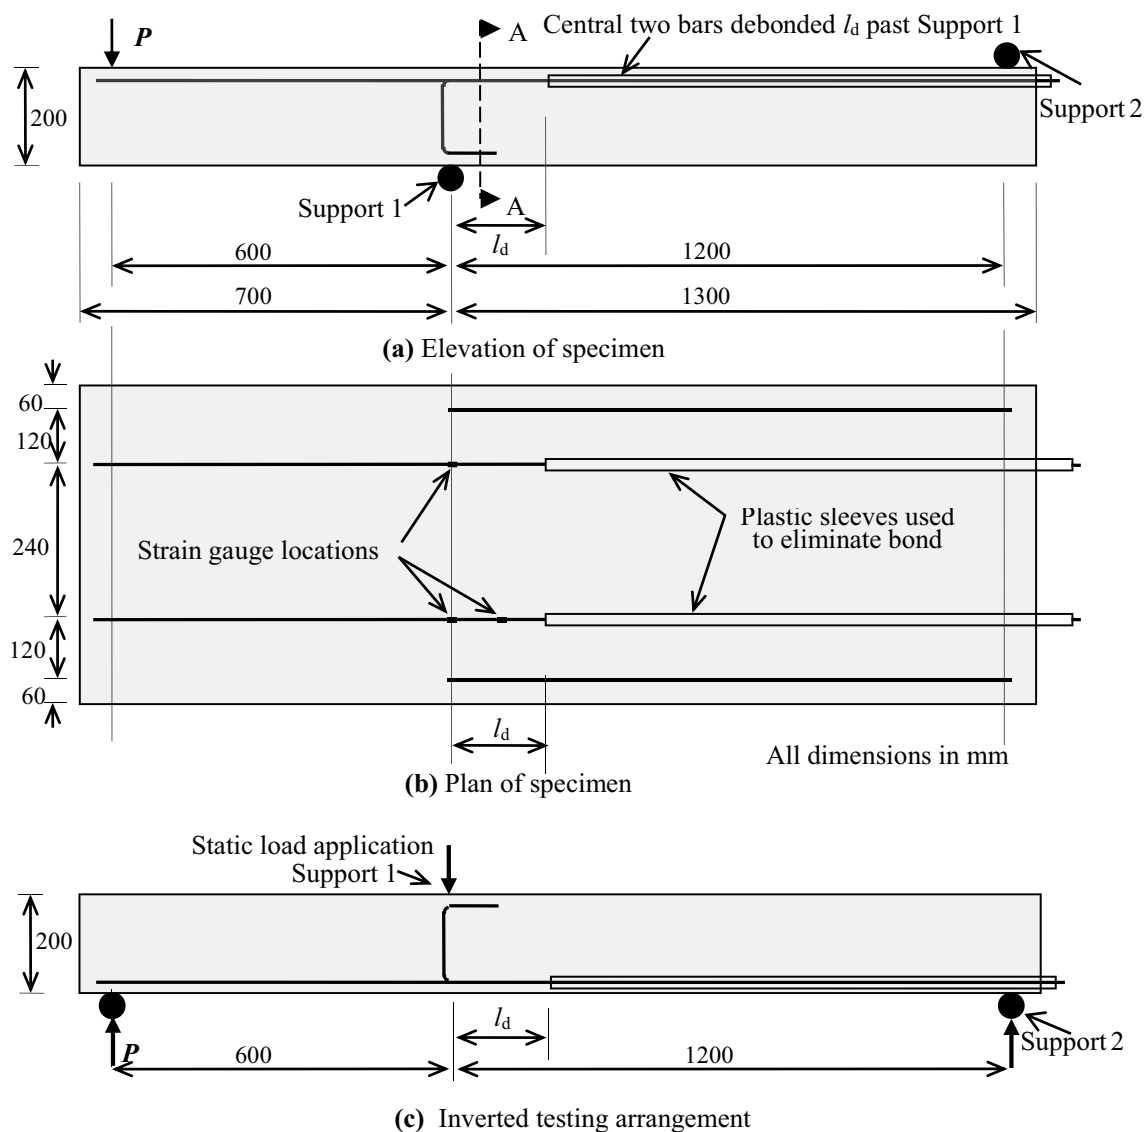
Dimensions and loading arrangements of anchorage length slab specimens
